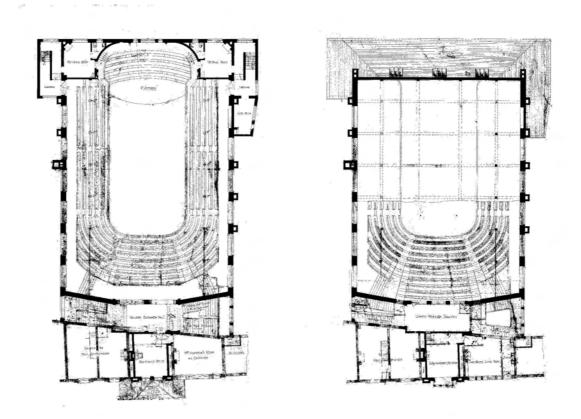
First and second floor plans of the Victoria Hall. Source: Bradshaw Gass and Hope, Bolton
